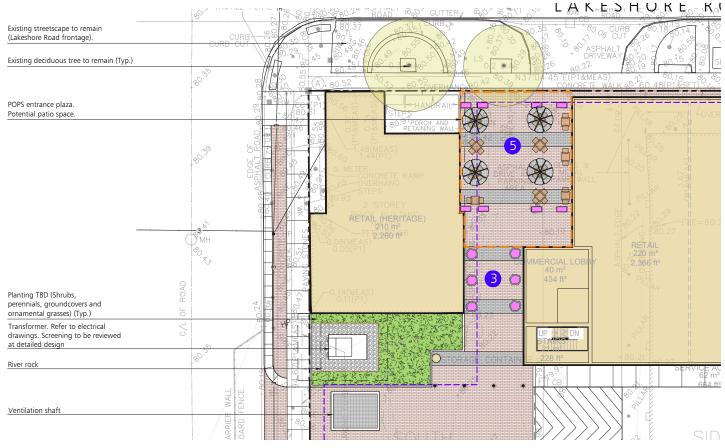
Landscape Plan showing the vision for the retained heritage listed building and new open space around it
